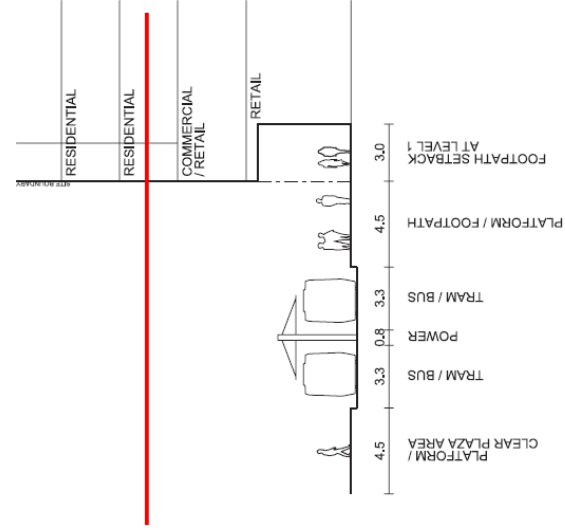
Local Street Type 3 Indicative Street Section – 12m (Section N)
